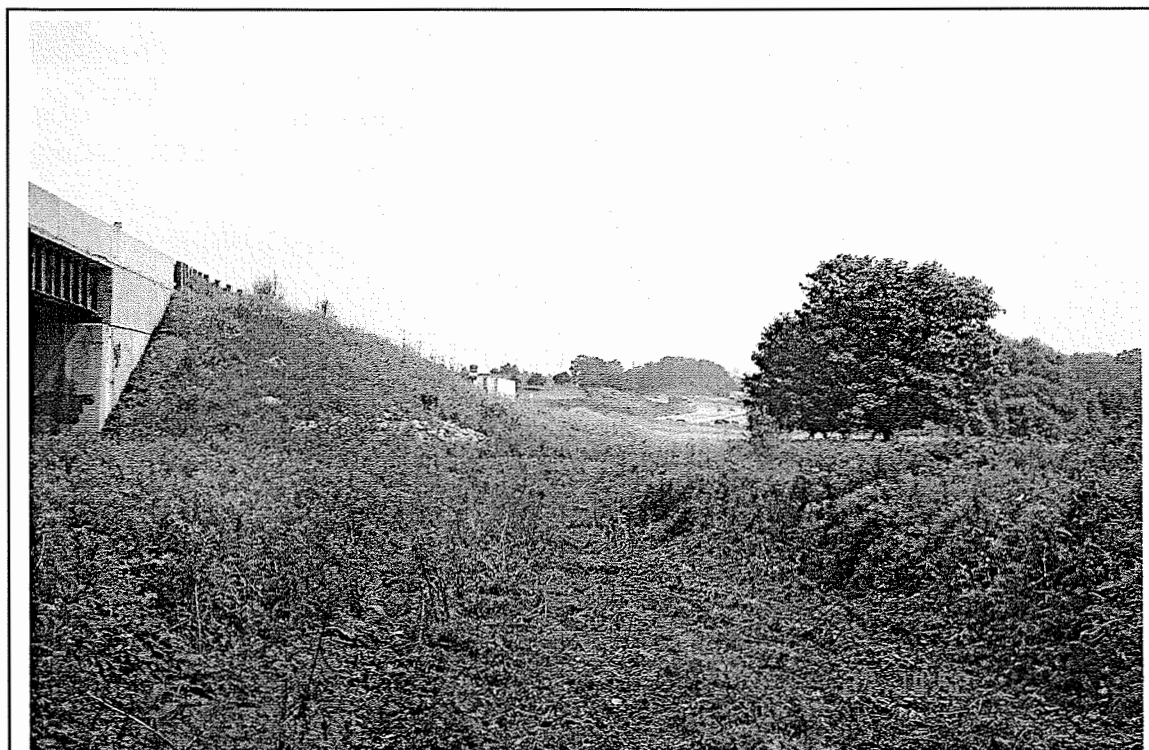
, July 2006 – Looking from flood plain on south side of Grand River towards South Abutment. Existing bridge on left side of photo.
